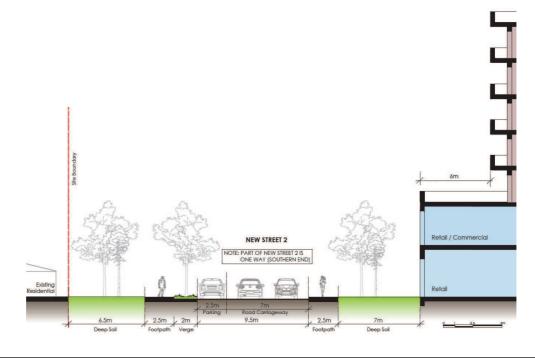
New Street 2 Setbacks – Northern End (Section E-E)
